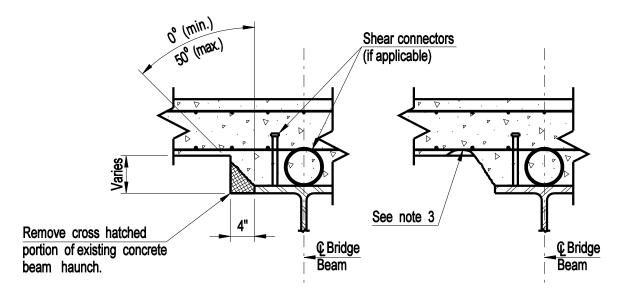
# DETAILS FOR CONCRETE HAUNCH REMOVAL
